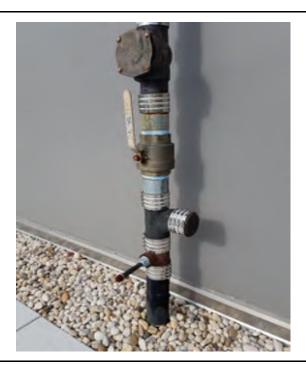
V2 riser and sample port in good condition, facing northeast. 27 February 2019.
